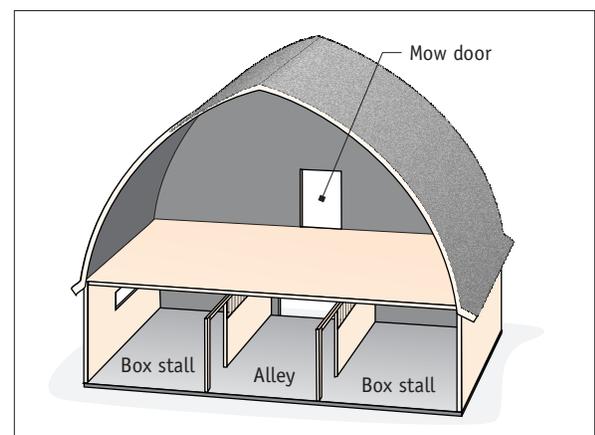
Gothic roof. Two rows of stalls serviced from center alley. Mow over (clear span, laminated rafters).
